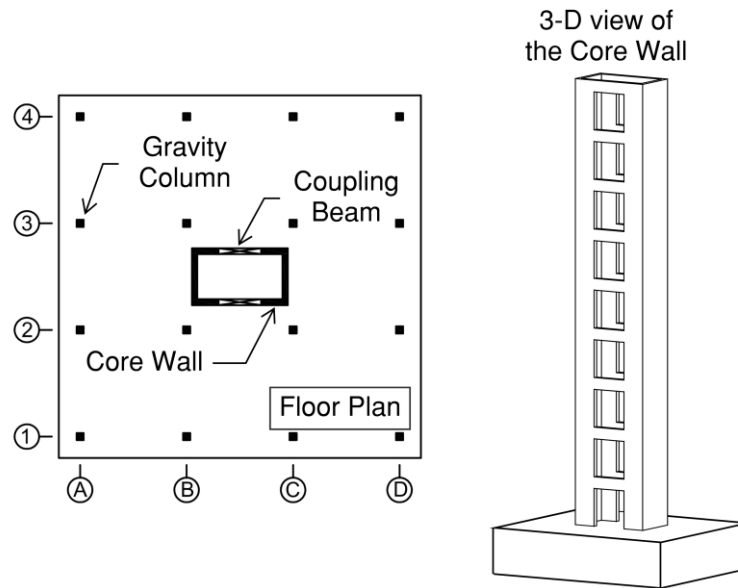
Typical floor plan of a structure with core wall and isolated 3-dimensional view of the core wall.
